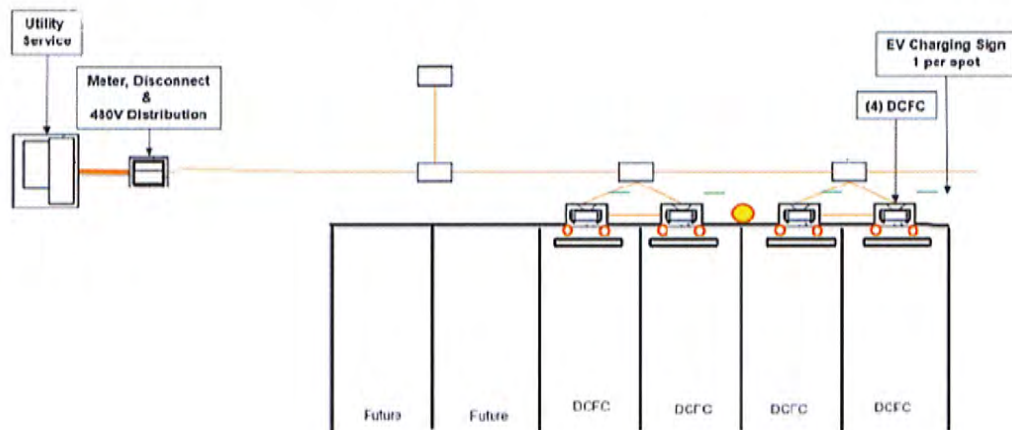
EVSE design above shows details for the ChargePoint electric vehicle supply equipment installation. Site specific details will be confirmed with engineered design and utility coordination.
